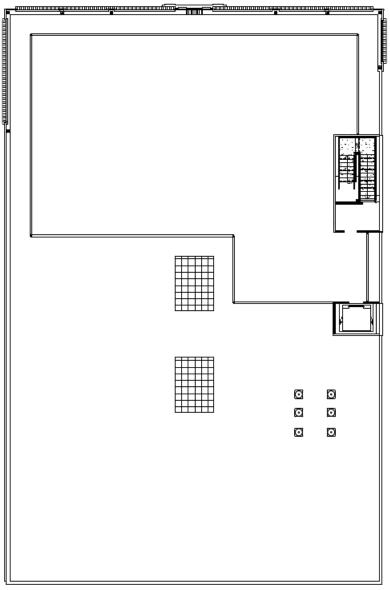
Existing Roof Plan. Courtesy of Open Studio Architecture. N
